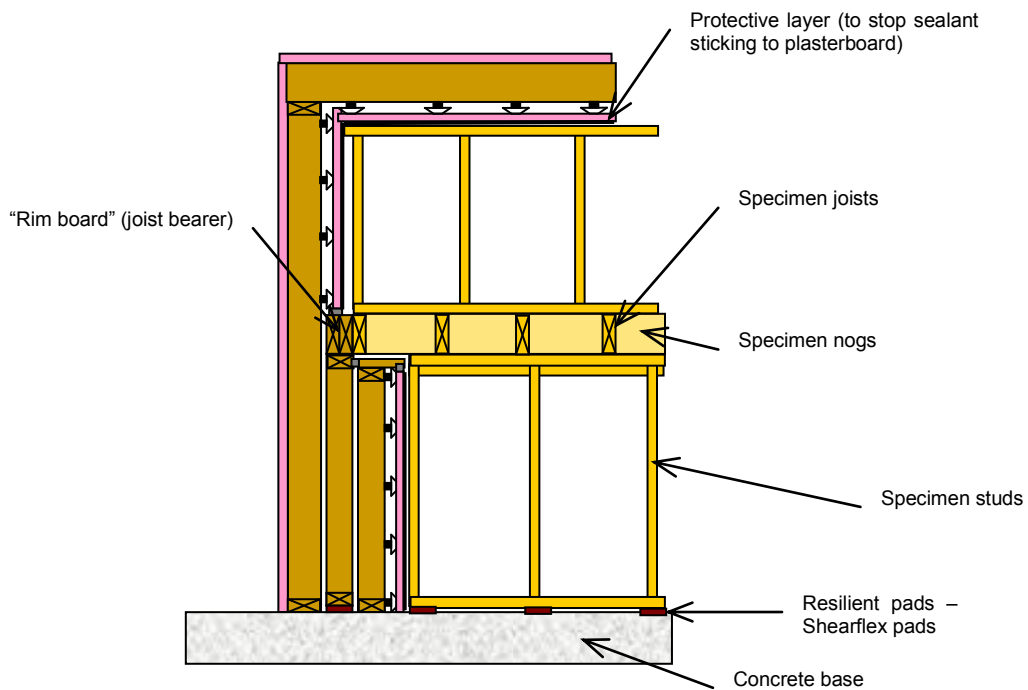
Elevation view of the side of the chamber – section Z-Z (not to scale)
